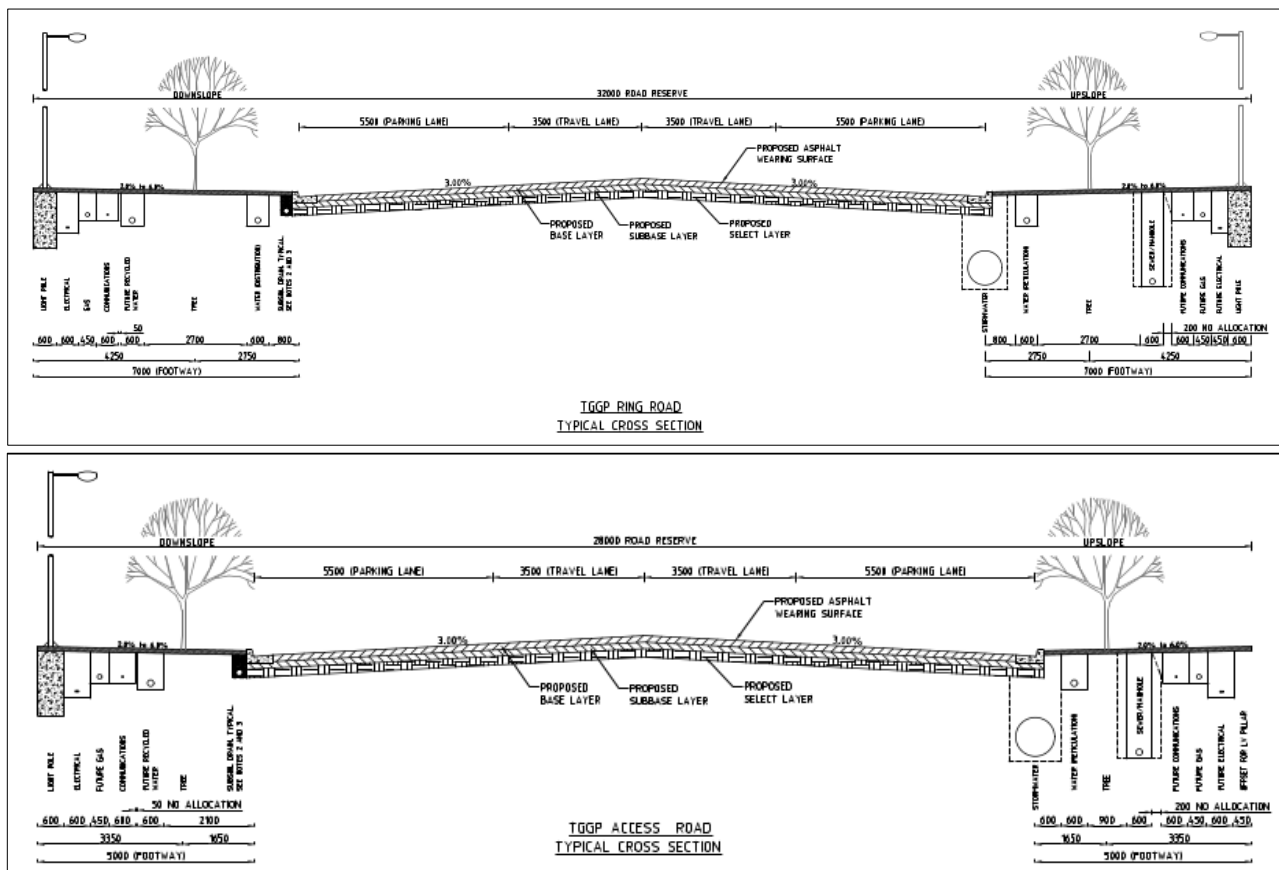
A – Typical Road Cross Sections – TGGP Ring Road
